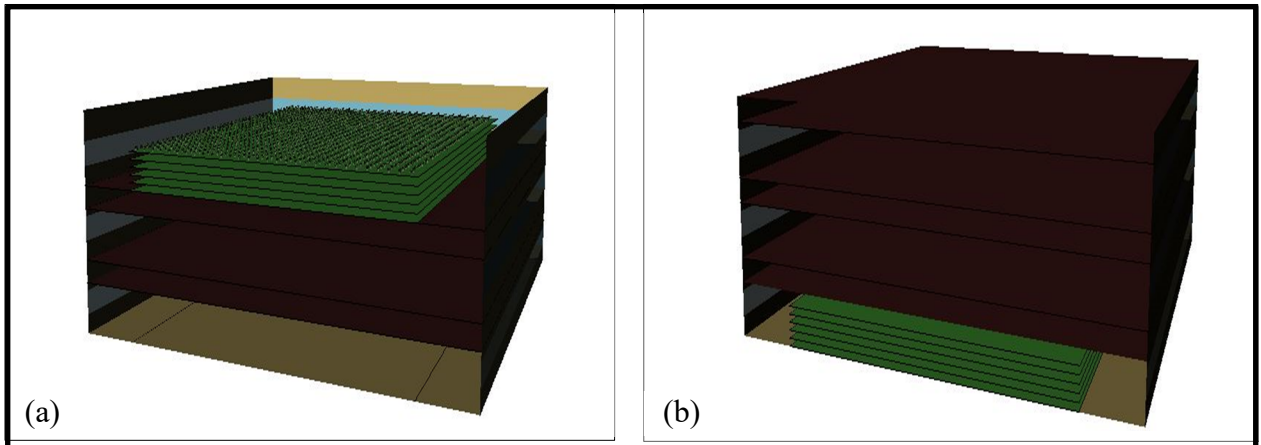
BIA location within the host building (a) Top floor (b) Bottom floor
